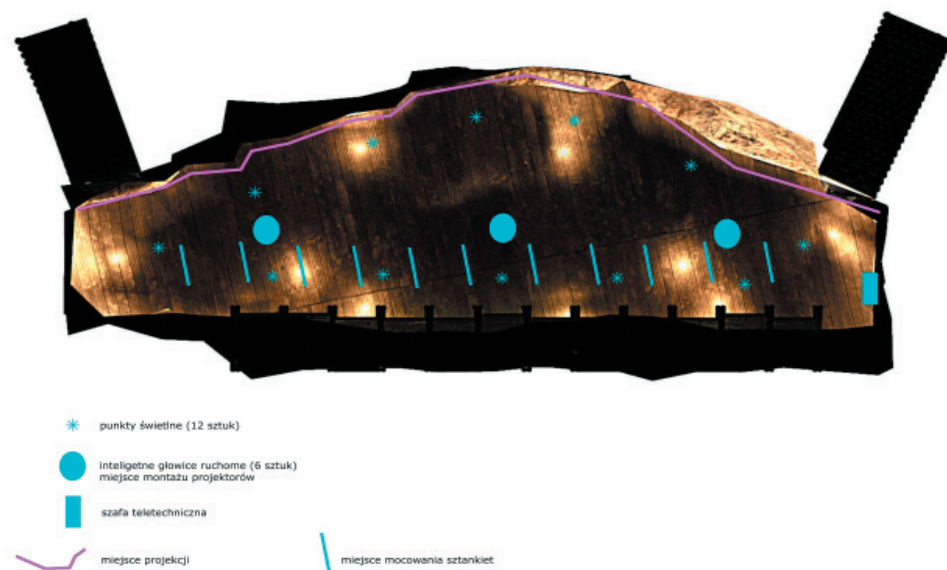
Multimedia systems installation plan in „Lill Górna” Chamber
